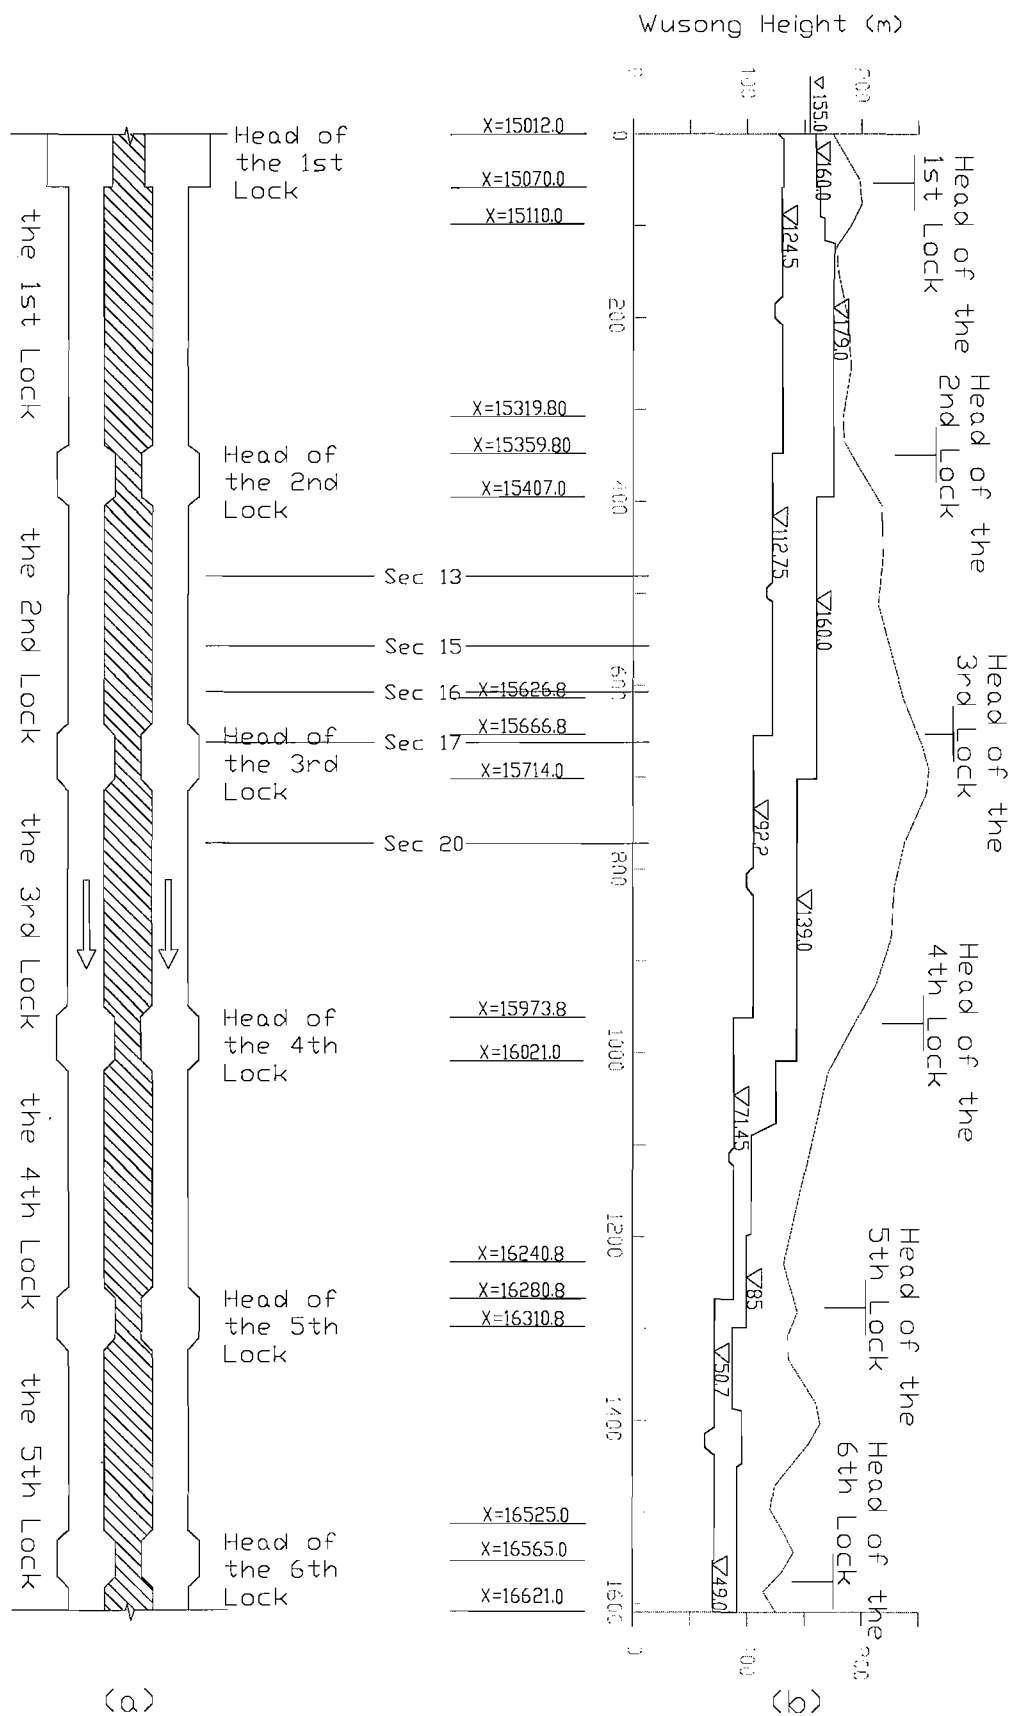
Plan view (a) and long section (b) and of shiplock steps
